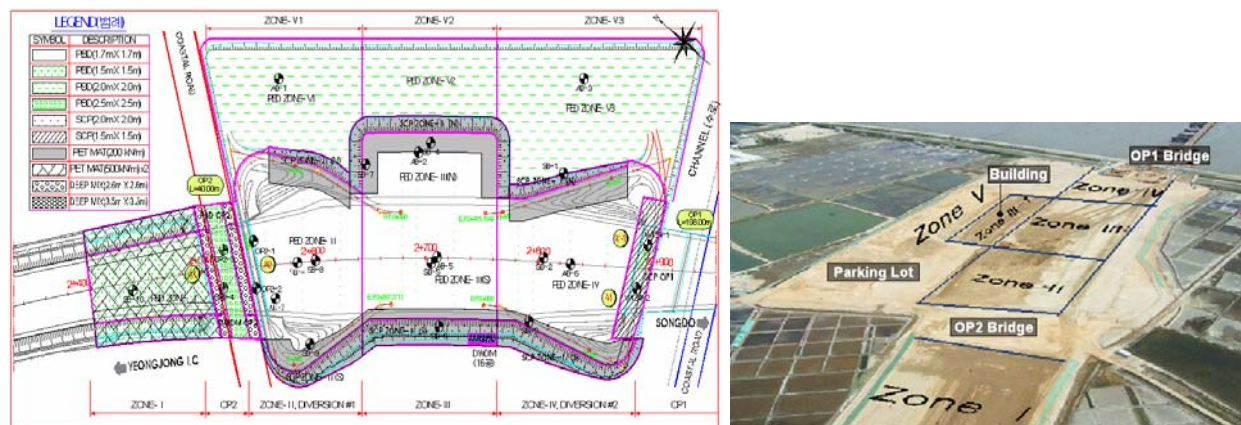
Plane view of the toll plaza section of Incheon Bridge
